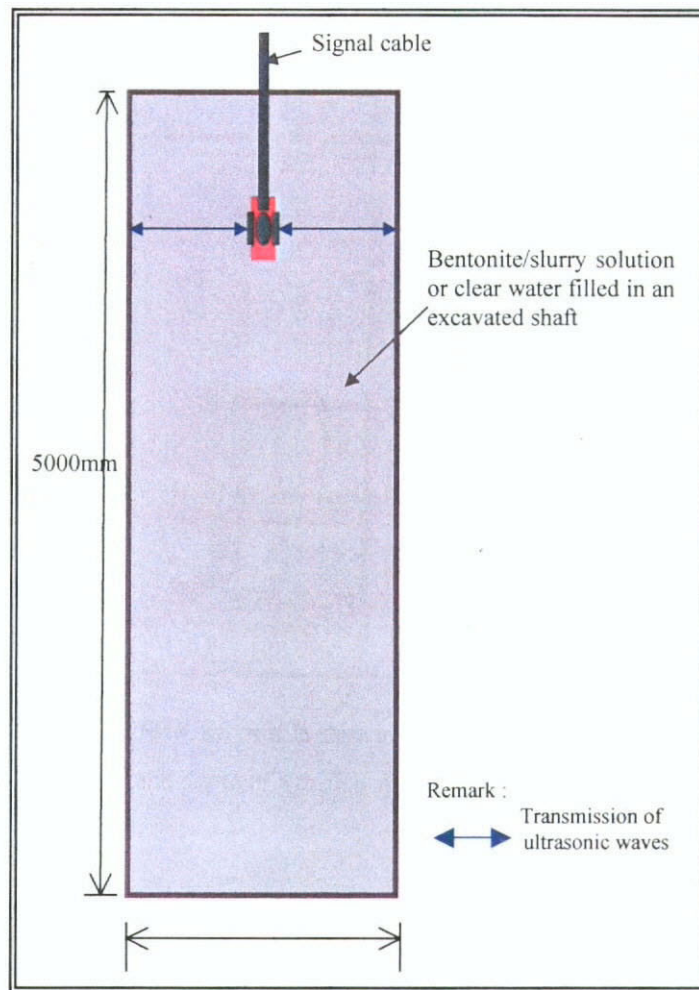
Schematic drawing showing an UES test in an excavated shaft
